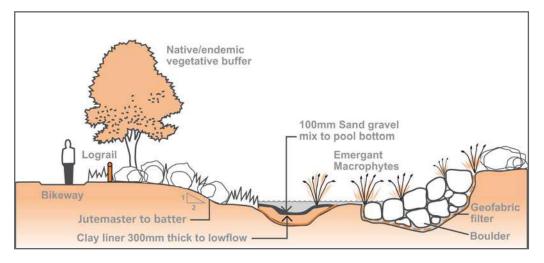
Elements of the Natural Drainage System Sources: Stormwater outlets in parks and waterways (Brisbane City Council, 2001)
